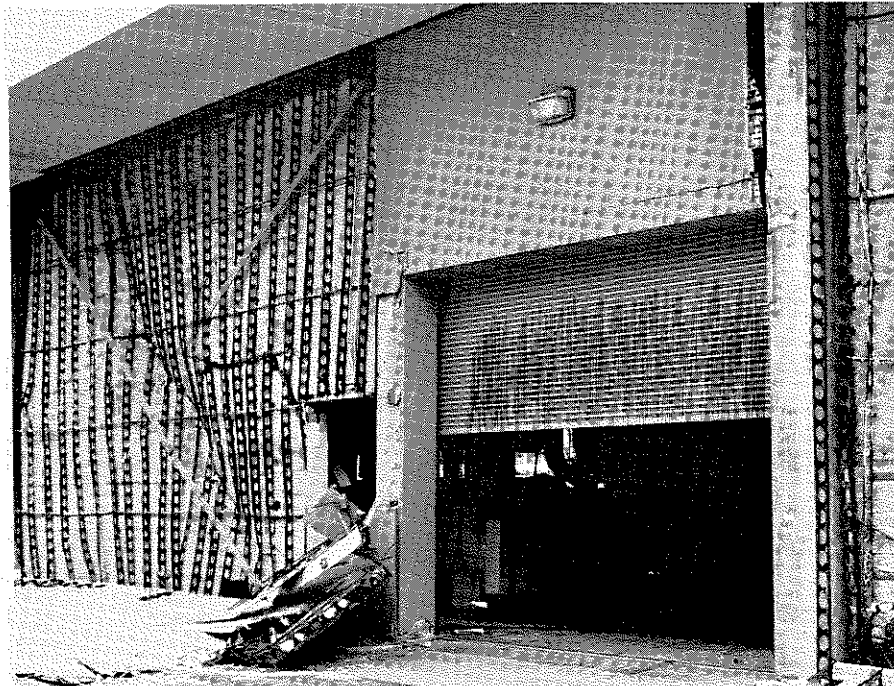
The two outside bays of the north wall of the power plant building at Olive View Hospital had steel strap crossbracing ($1/2'' \times 4''$). One strap failed at the weld and its companion had almost failed. The two straps in the west panel were badly deformed.
